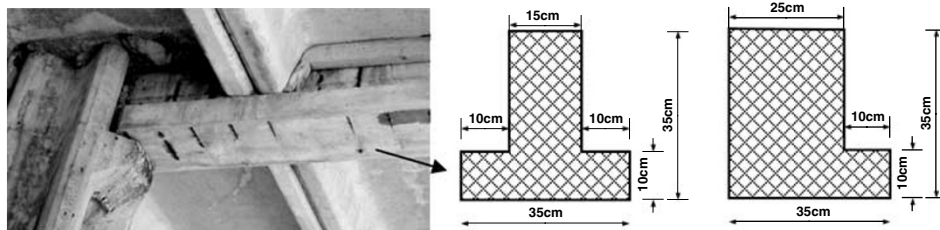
Prestressed reinforced concrete beams with 'I' or 'L' cross-section
